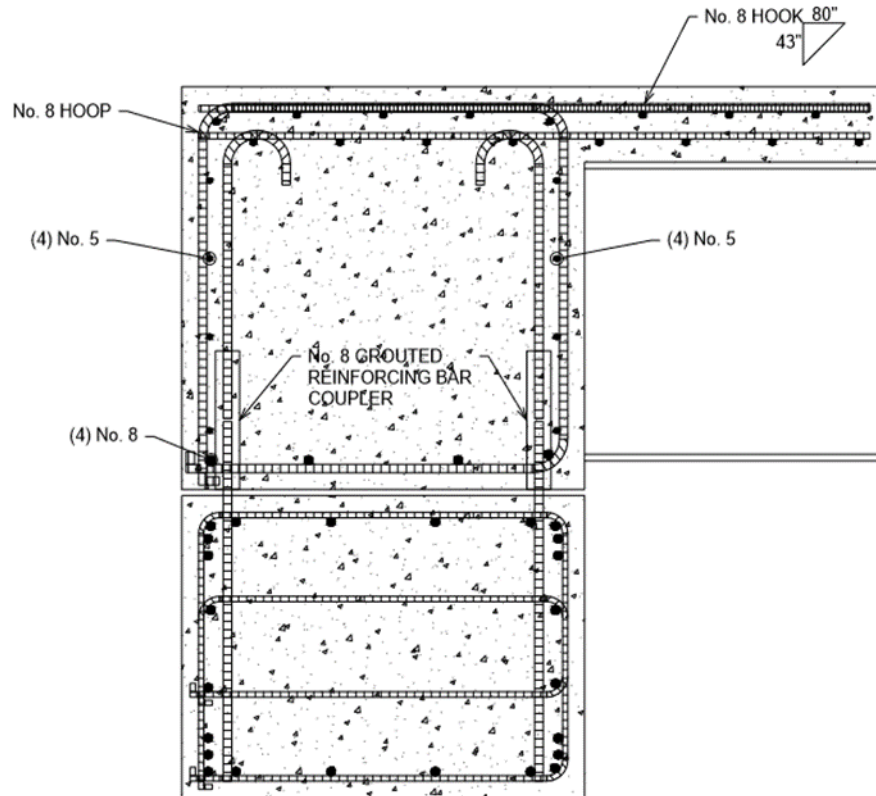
Grouted reinforcing bar coupler section view through couplers.
